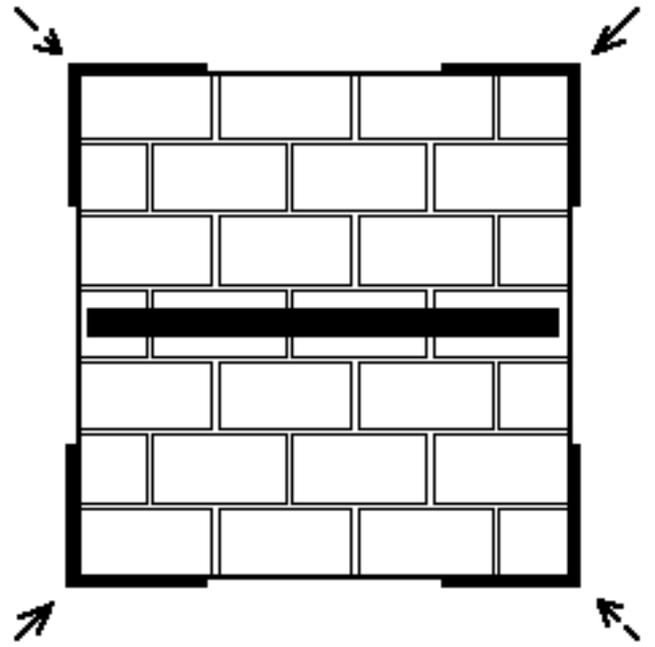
Test arrangement for horizontally reinforced panels under cyclic loading (CH).
